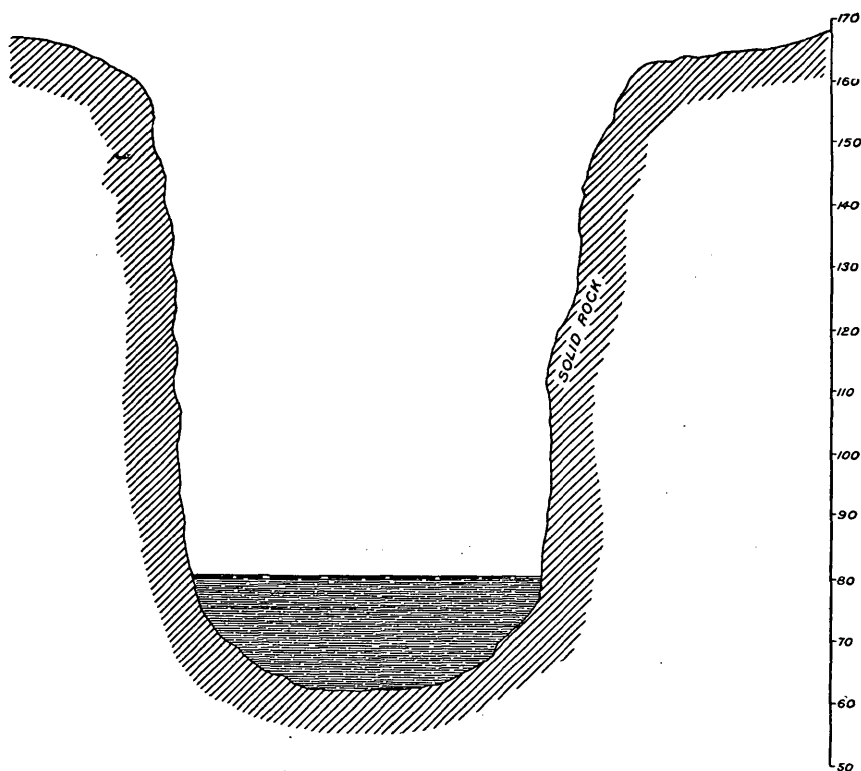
Vertical section at dam site on Elwha River, Washington.
